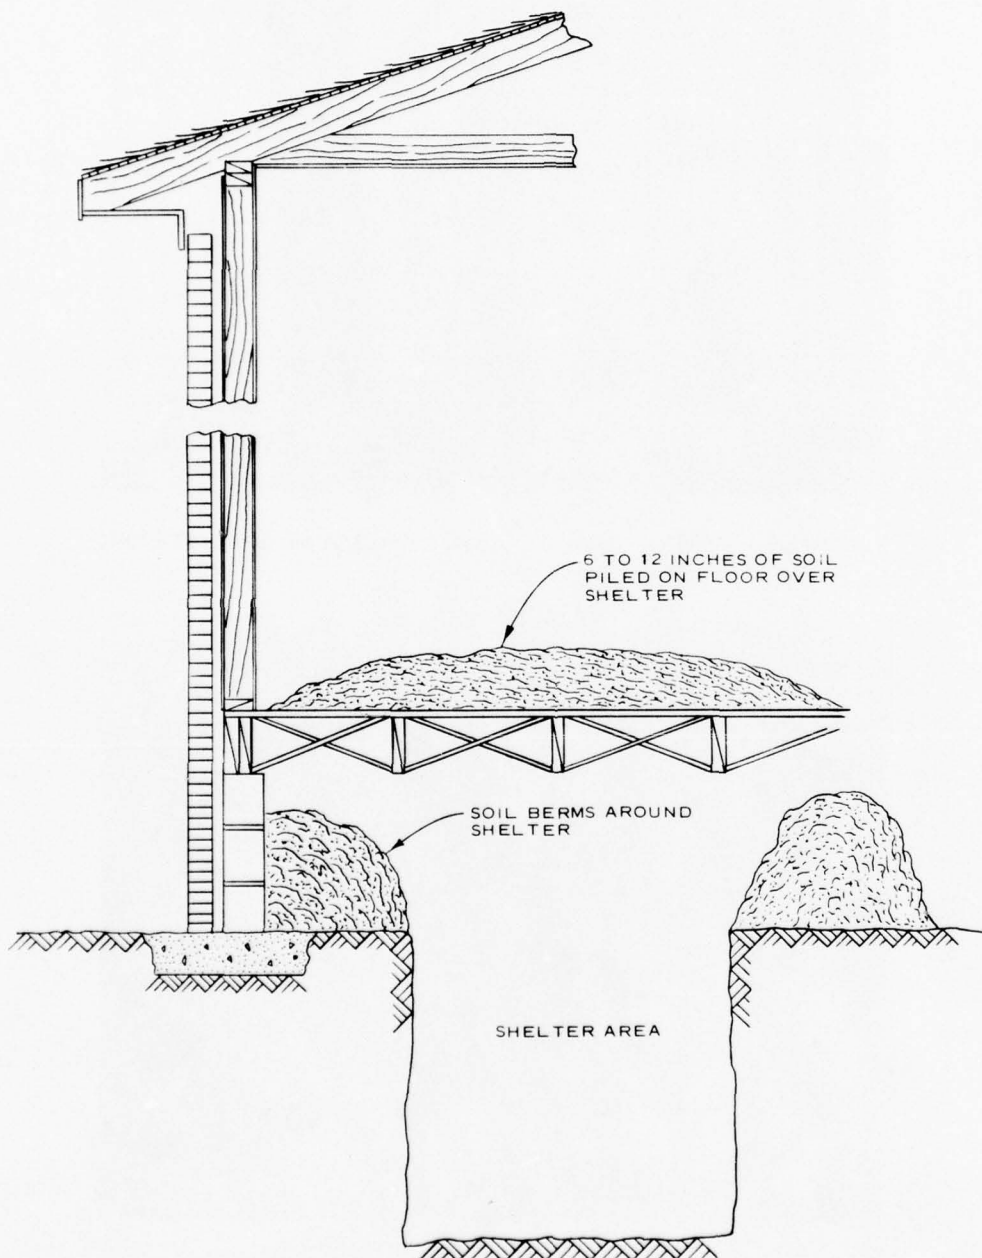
Single-family shelter constructed under a house having a conventional foundation.
